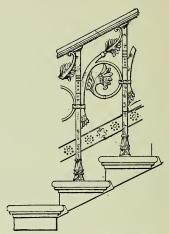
Part Side Elevation of Overhanging Stone Stair.
